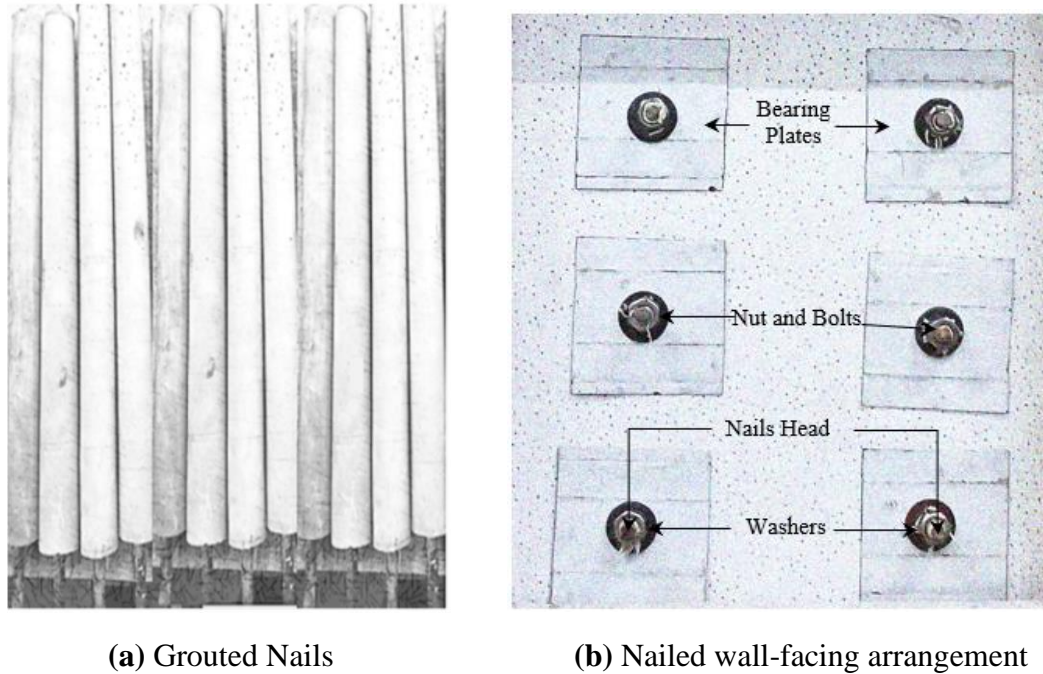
Grouted nails and nailed wall (facing) used in the experimental study
